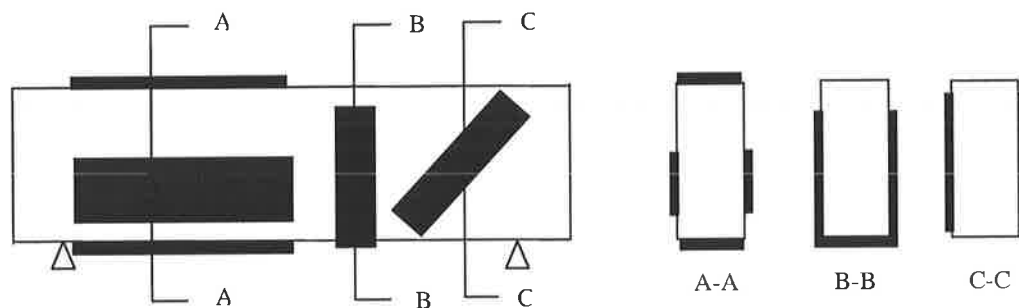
Longitudinal and transverse externally bonded plates.
